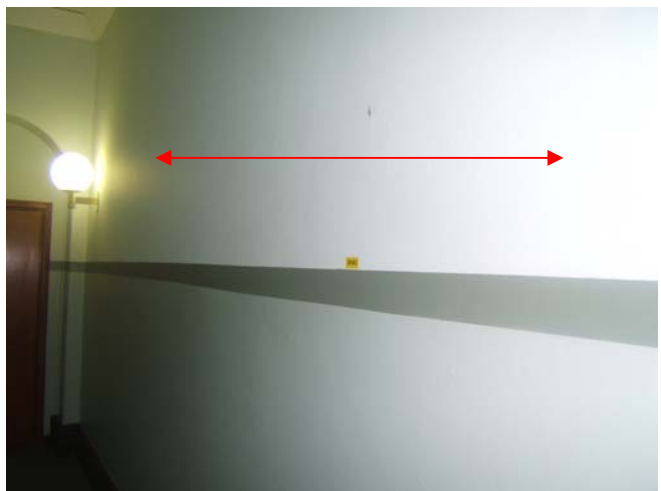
SMF dust on ceiling within western and eastern wing of the courthouse.
